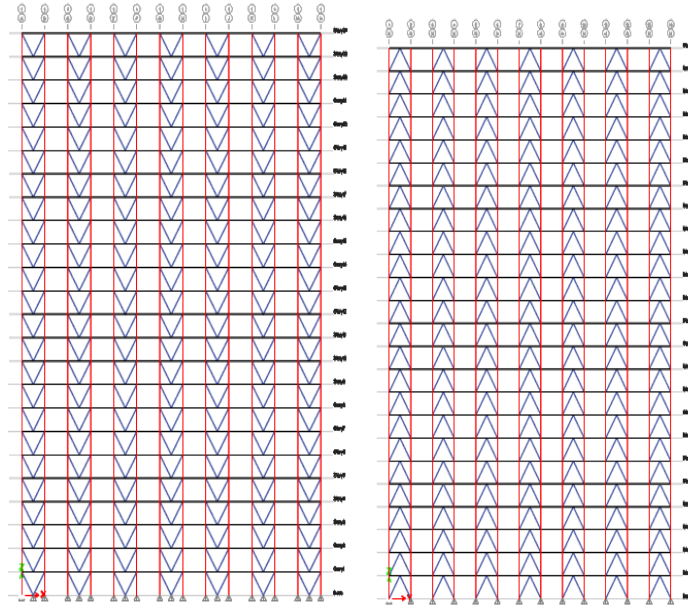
Elevation with V Bracing Fig.1e: Elevation with inverted V Bracing
